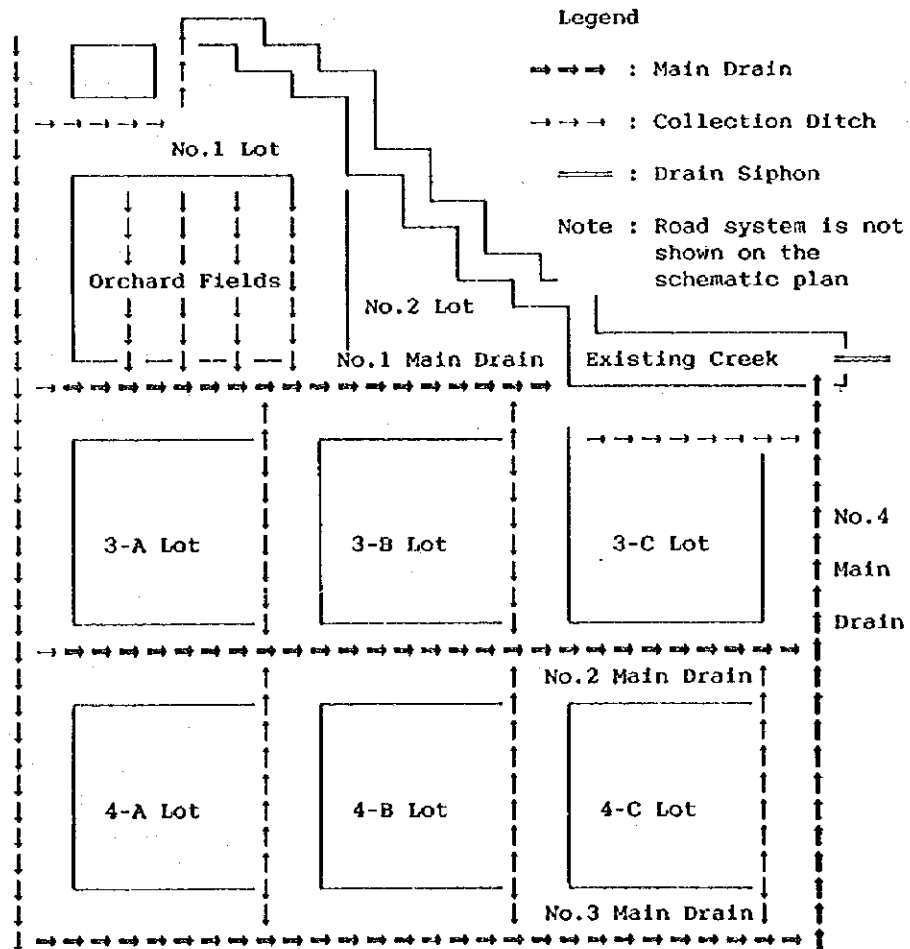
Schematic plan of the project drainage system plan, the drainage capacity was designed based on the probable intensity
